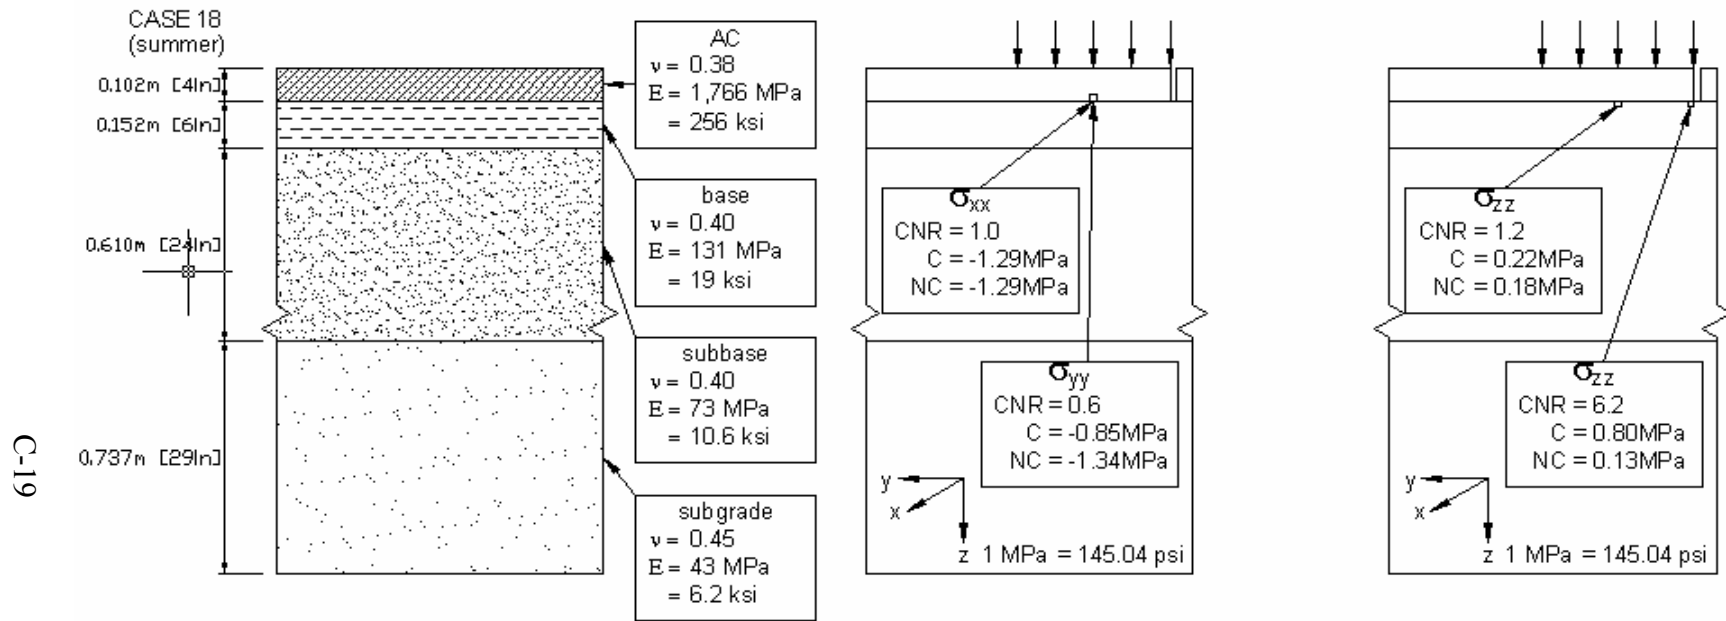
Summary cross section for case 18, (C – stress in cracked pavement, NC – stress in pavement with no crack, CNR – crack/no crack (stress) ratio)
